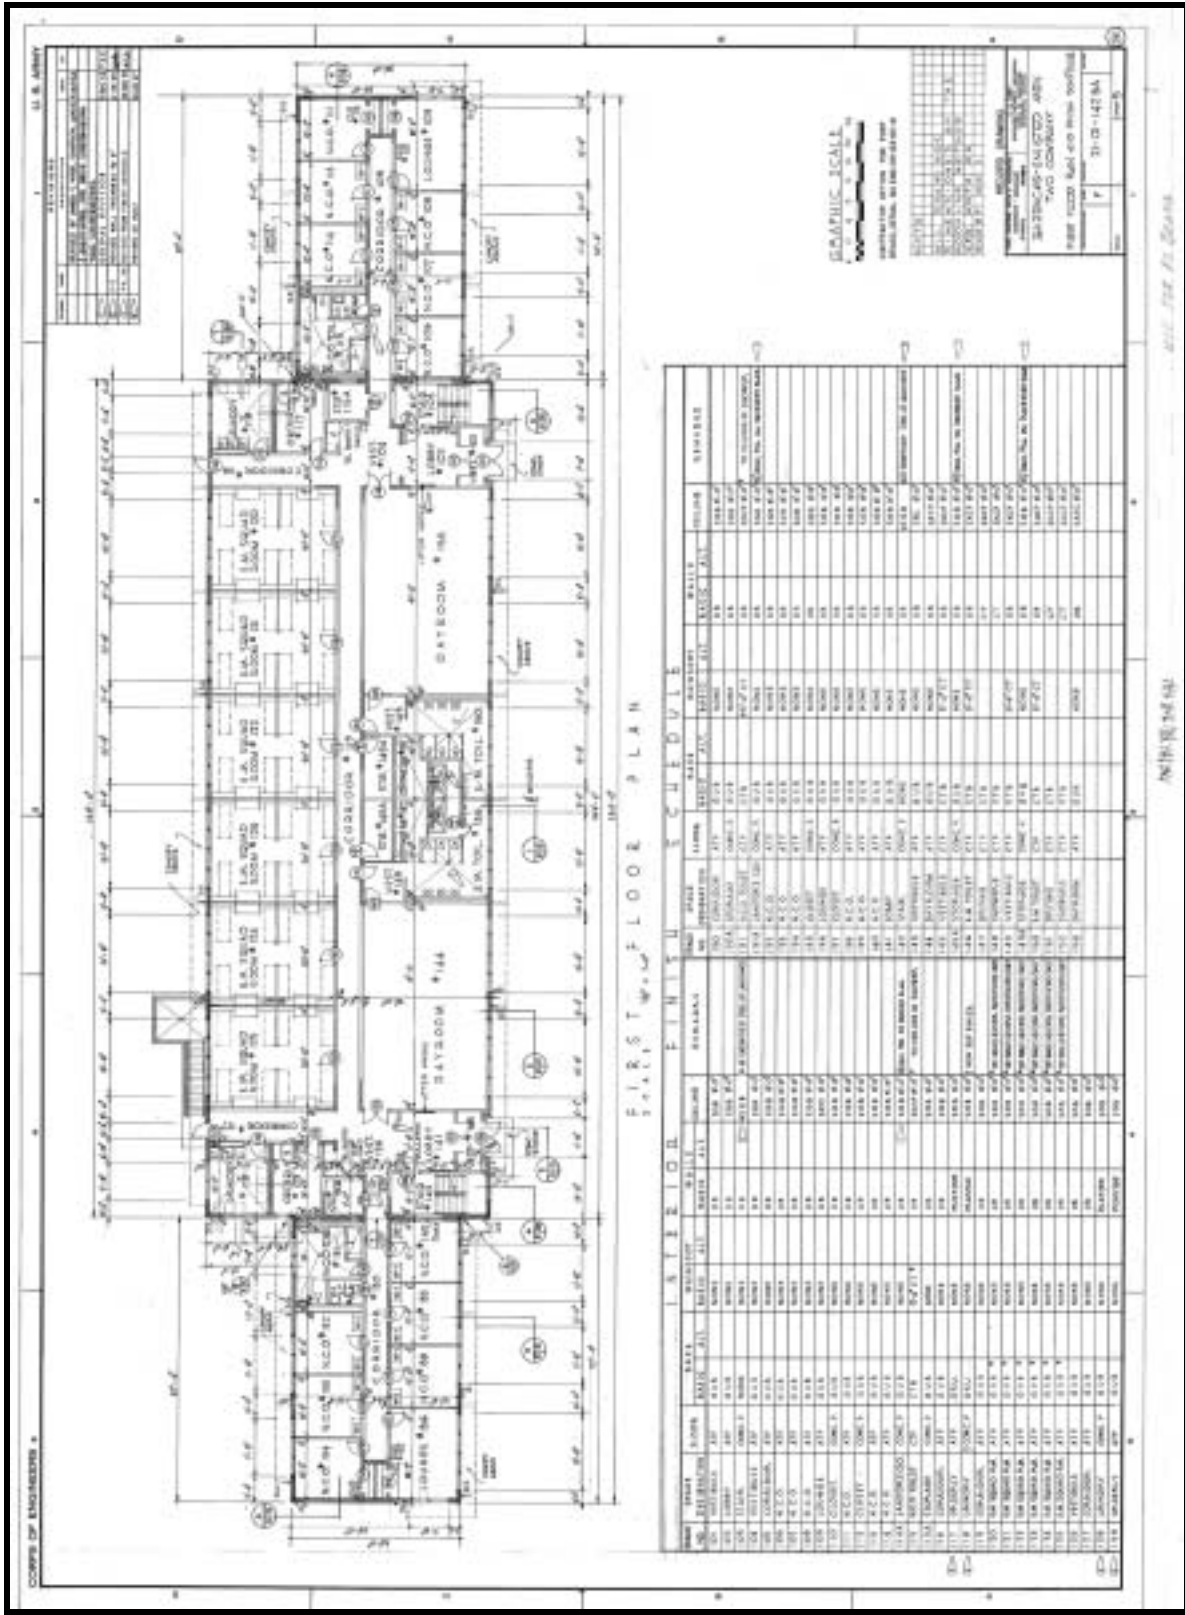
Rolling pin, two-company barracks, first floor plan, Ft. Bragg (ca. 1959, revised 1967) (Engineering, Ft. Bragg).
